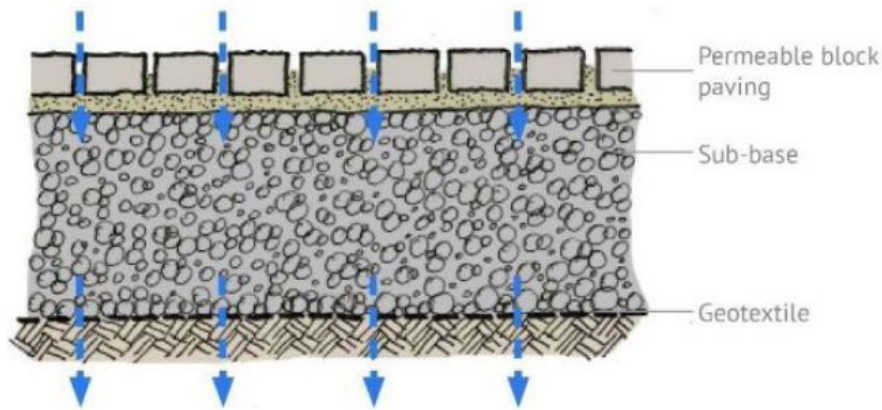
Typical section through permeable paving and sub-base showing infiltration
